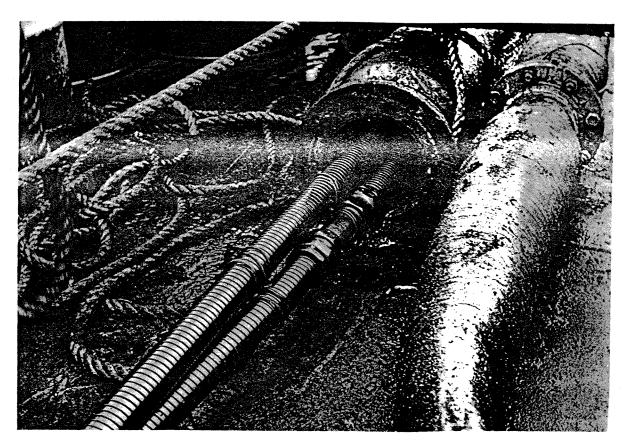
Convoluted Metal Hose Used for Fabricating Steam Traces.
